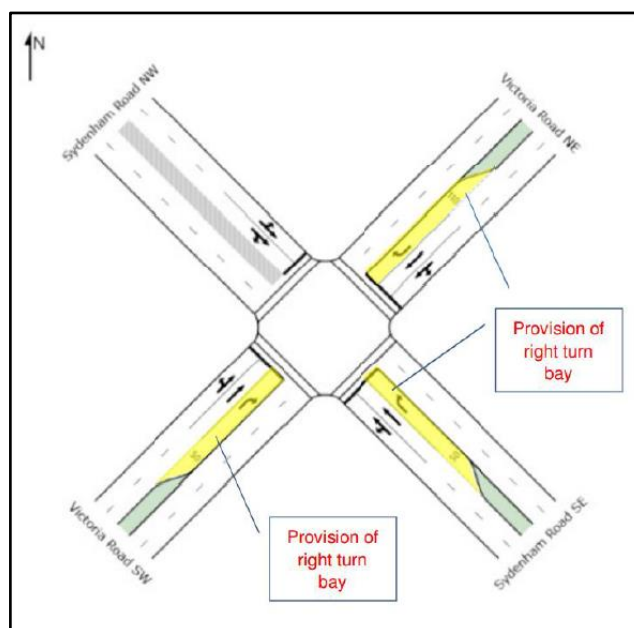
Required Upgrade on the intersection of Sydenham Road and Victoria Road
